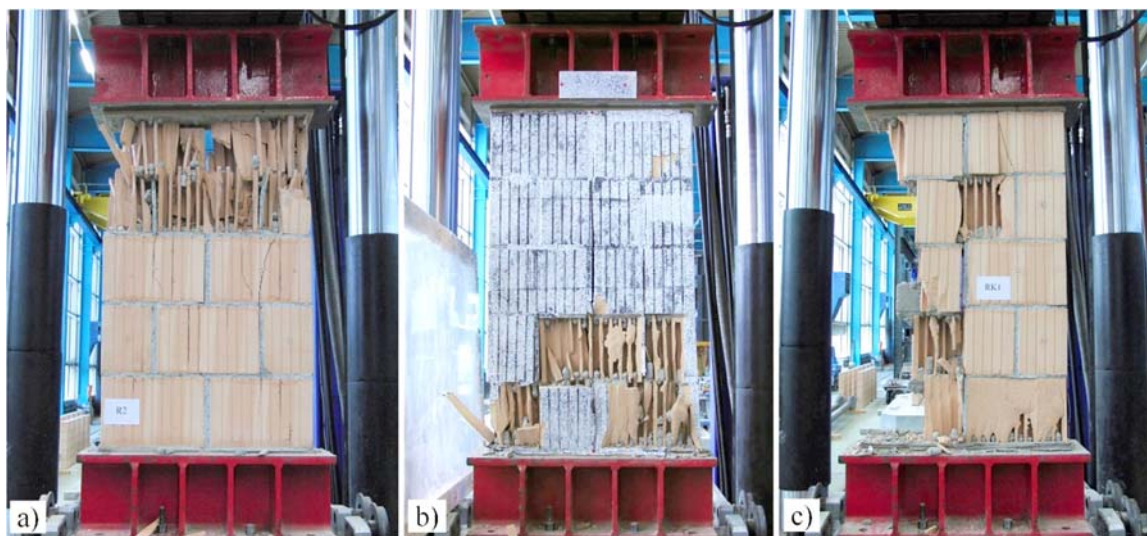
Failure pattern: a) Specimen R2; b) Specimen RB3; c) Specimen RK1
